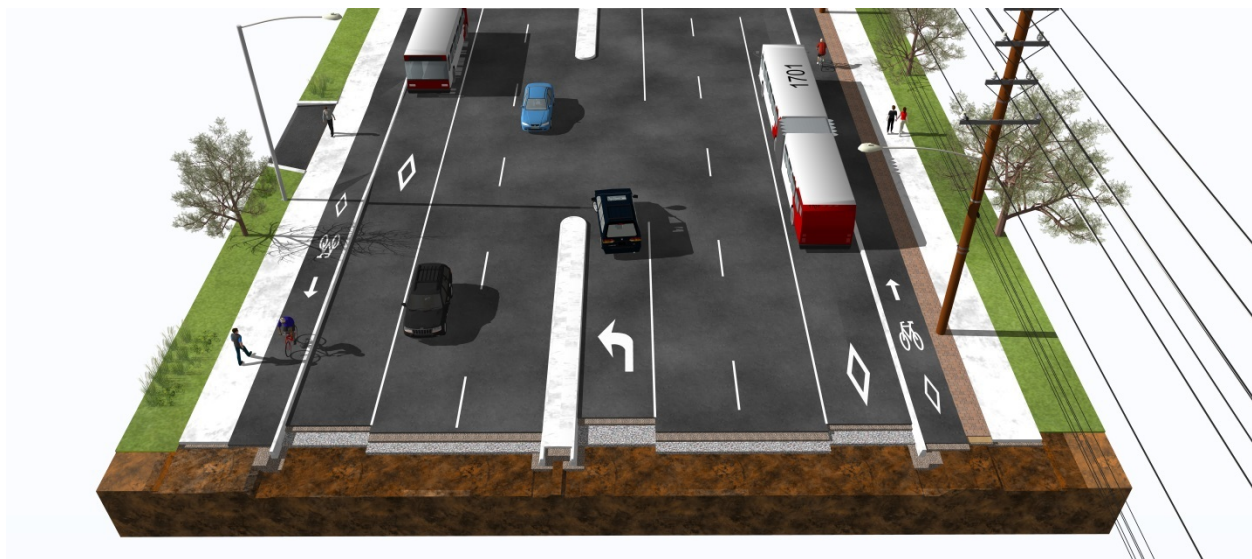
Typical cross-section, Innes Road / Industrial Avenue to Smyth
